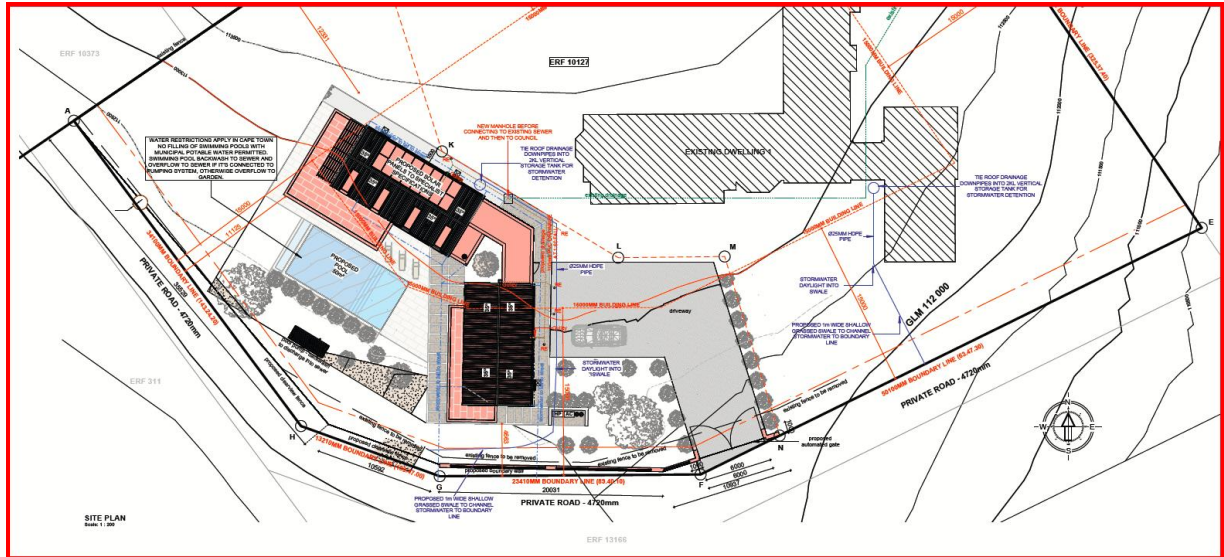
Extract of Approved Building Plan for the Second Dwelling
